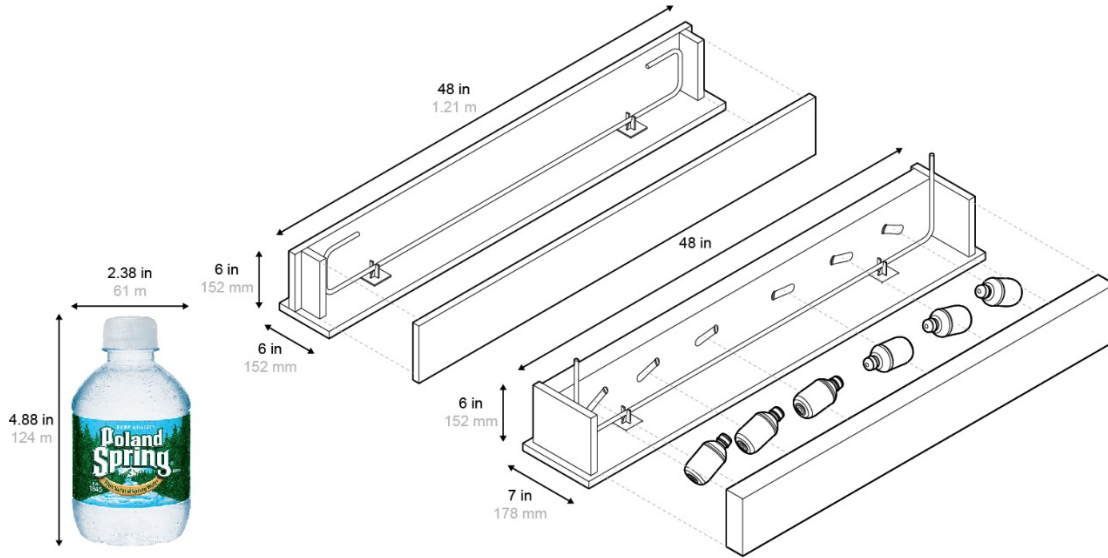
Diagram of formwork construction for control and cavity beams and bottle dimensions
